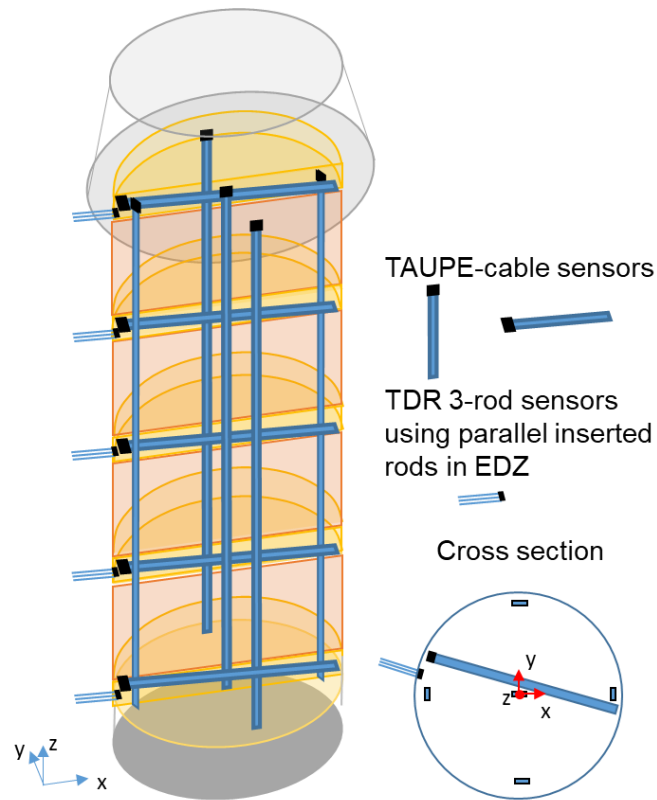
TDR sensors in the Sandwich sealing and borehole wall of shaft 1
